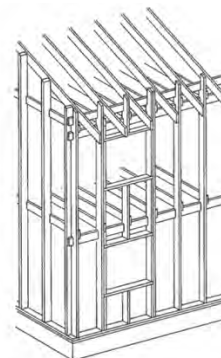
Balloon frame construction, timber stud construction⁹²
